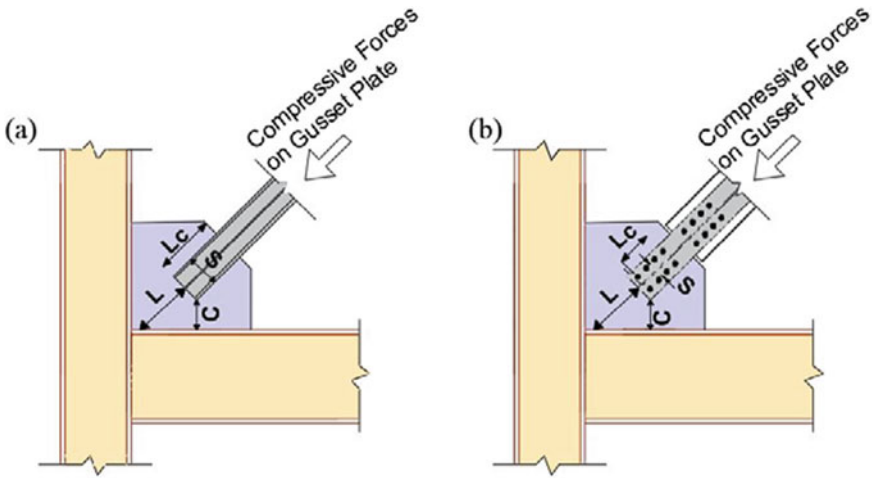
Schematic diagram of a welded and b bolted gusset plates used in model development
